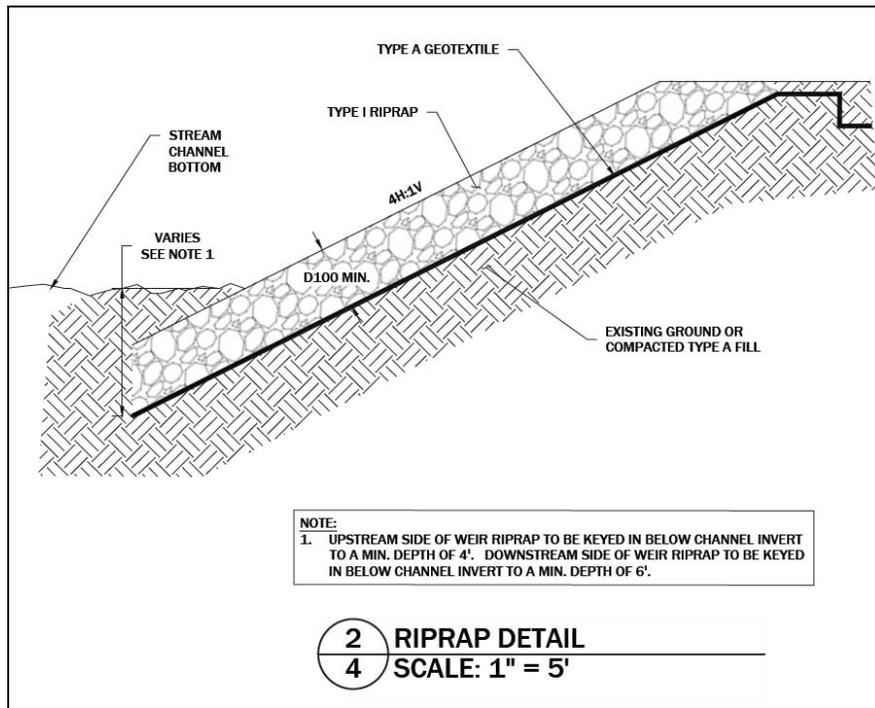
Schematic cross- section of the proposed South Channel riprap.
